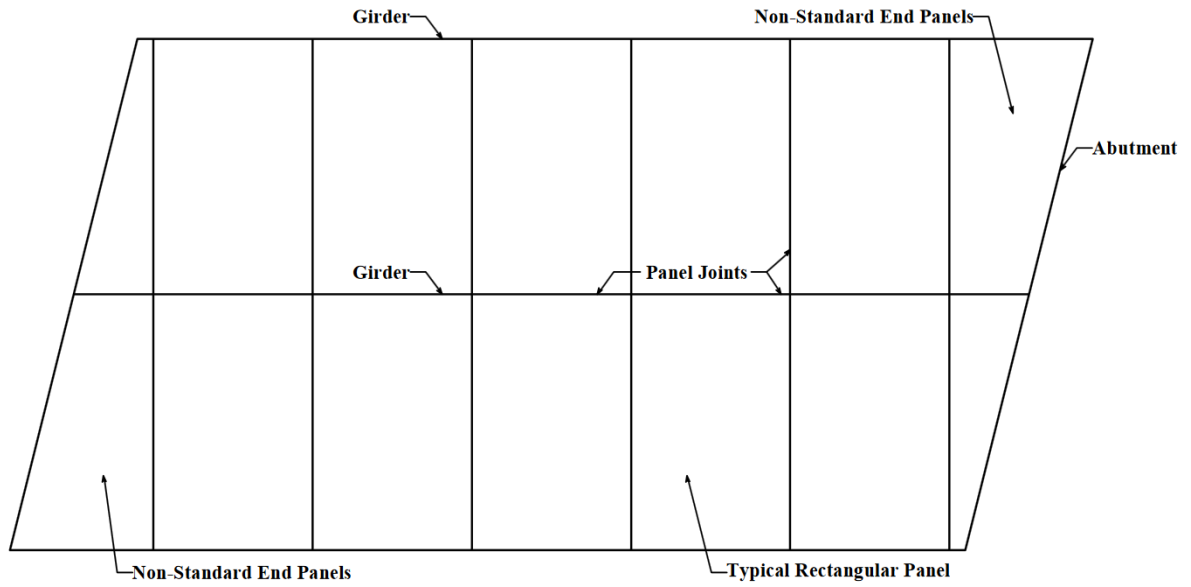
Skewed Bridge Option 2 – Rectangular Panels with Non-Standard End Panels
